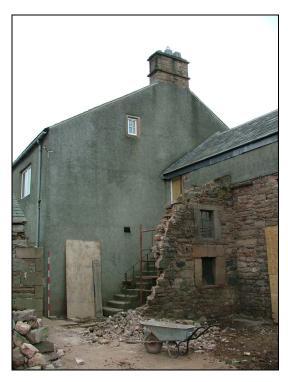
North gable of main house showing stone stairs and remains of extension with windows (Scale = 2m)
